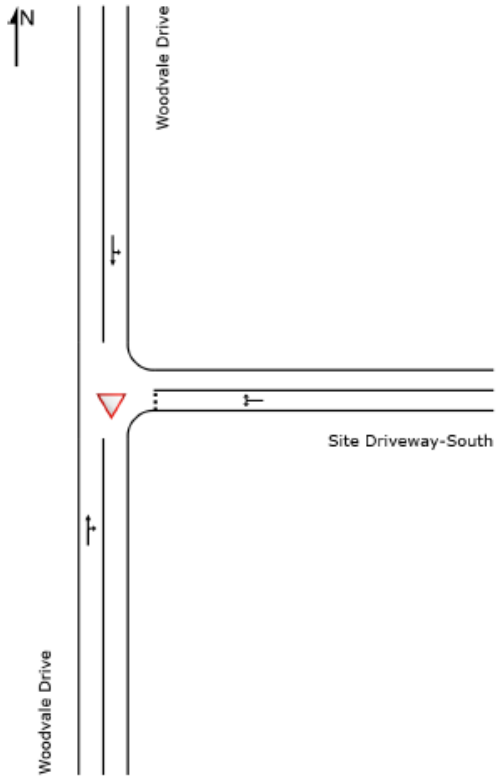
Woodvale Drive/Development Access-1 SIDRA Layout
